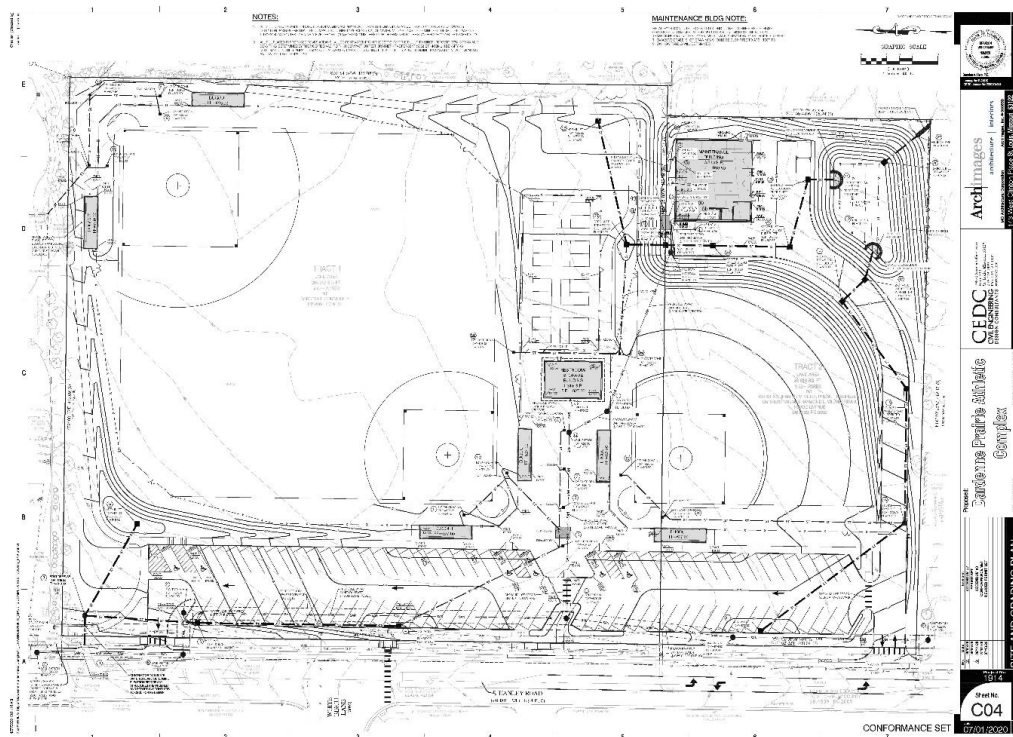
Maintenance Shed site plan/grading plan reference. The City should retain the full-size plan separately if needed for facility inspections.
